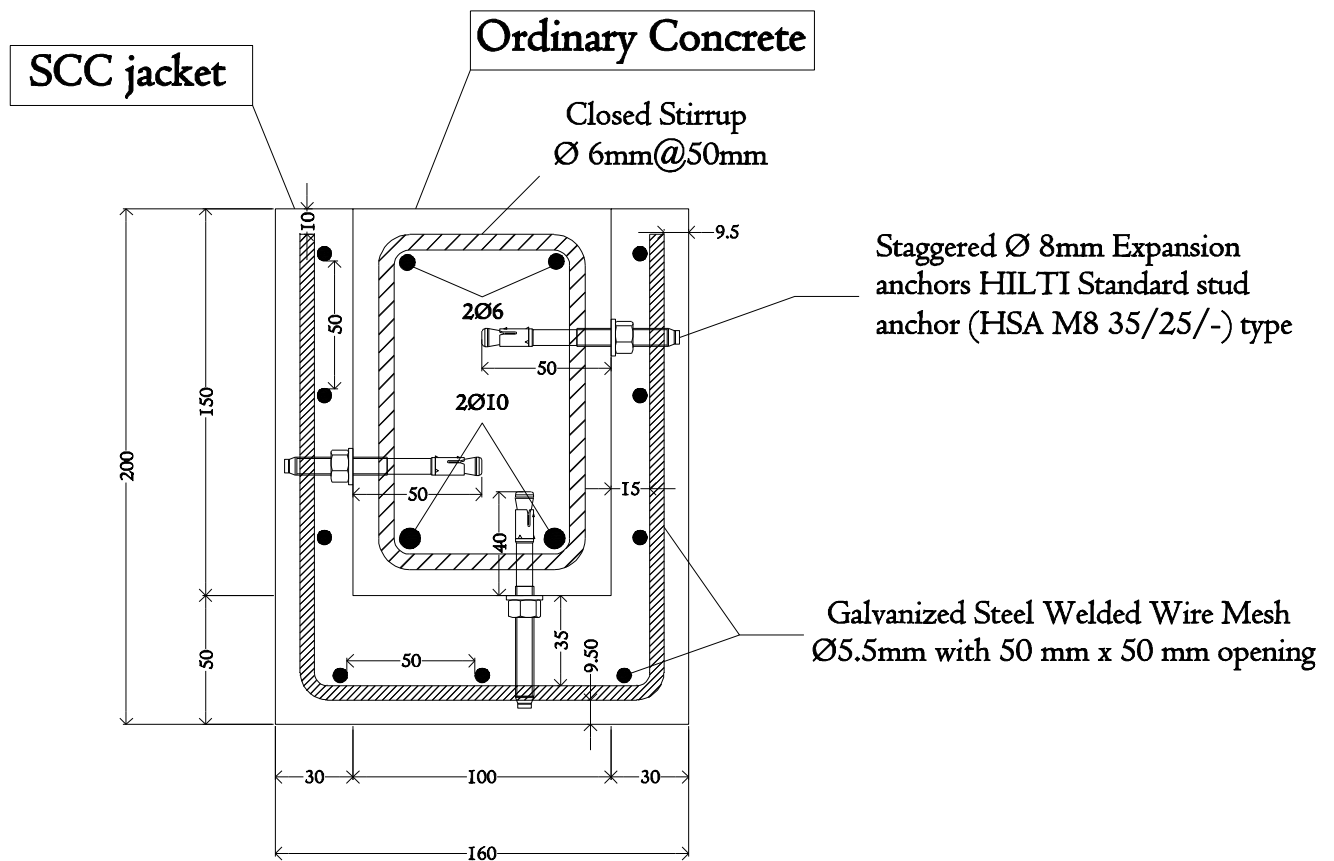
Strengthened beams GB.B1 and GB.B2 cross section (mm).
